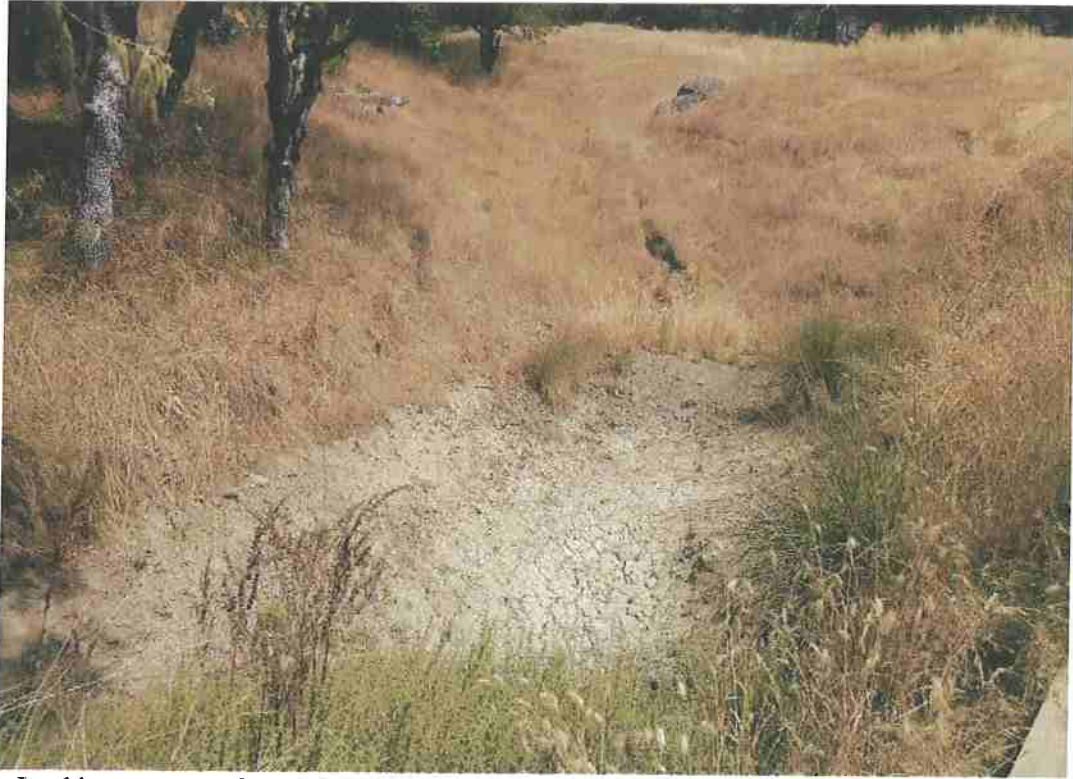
Looking upstream from inlet at 8-inch culvert stream crossing. Pool forms here and spills onto road.
